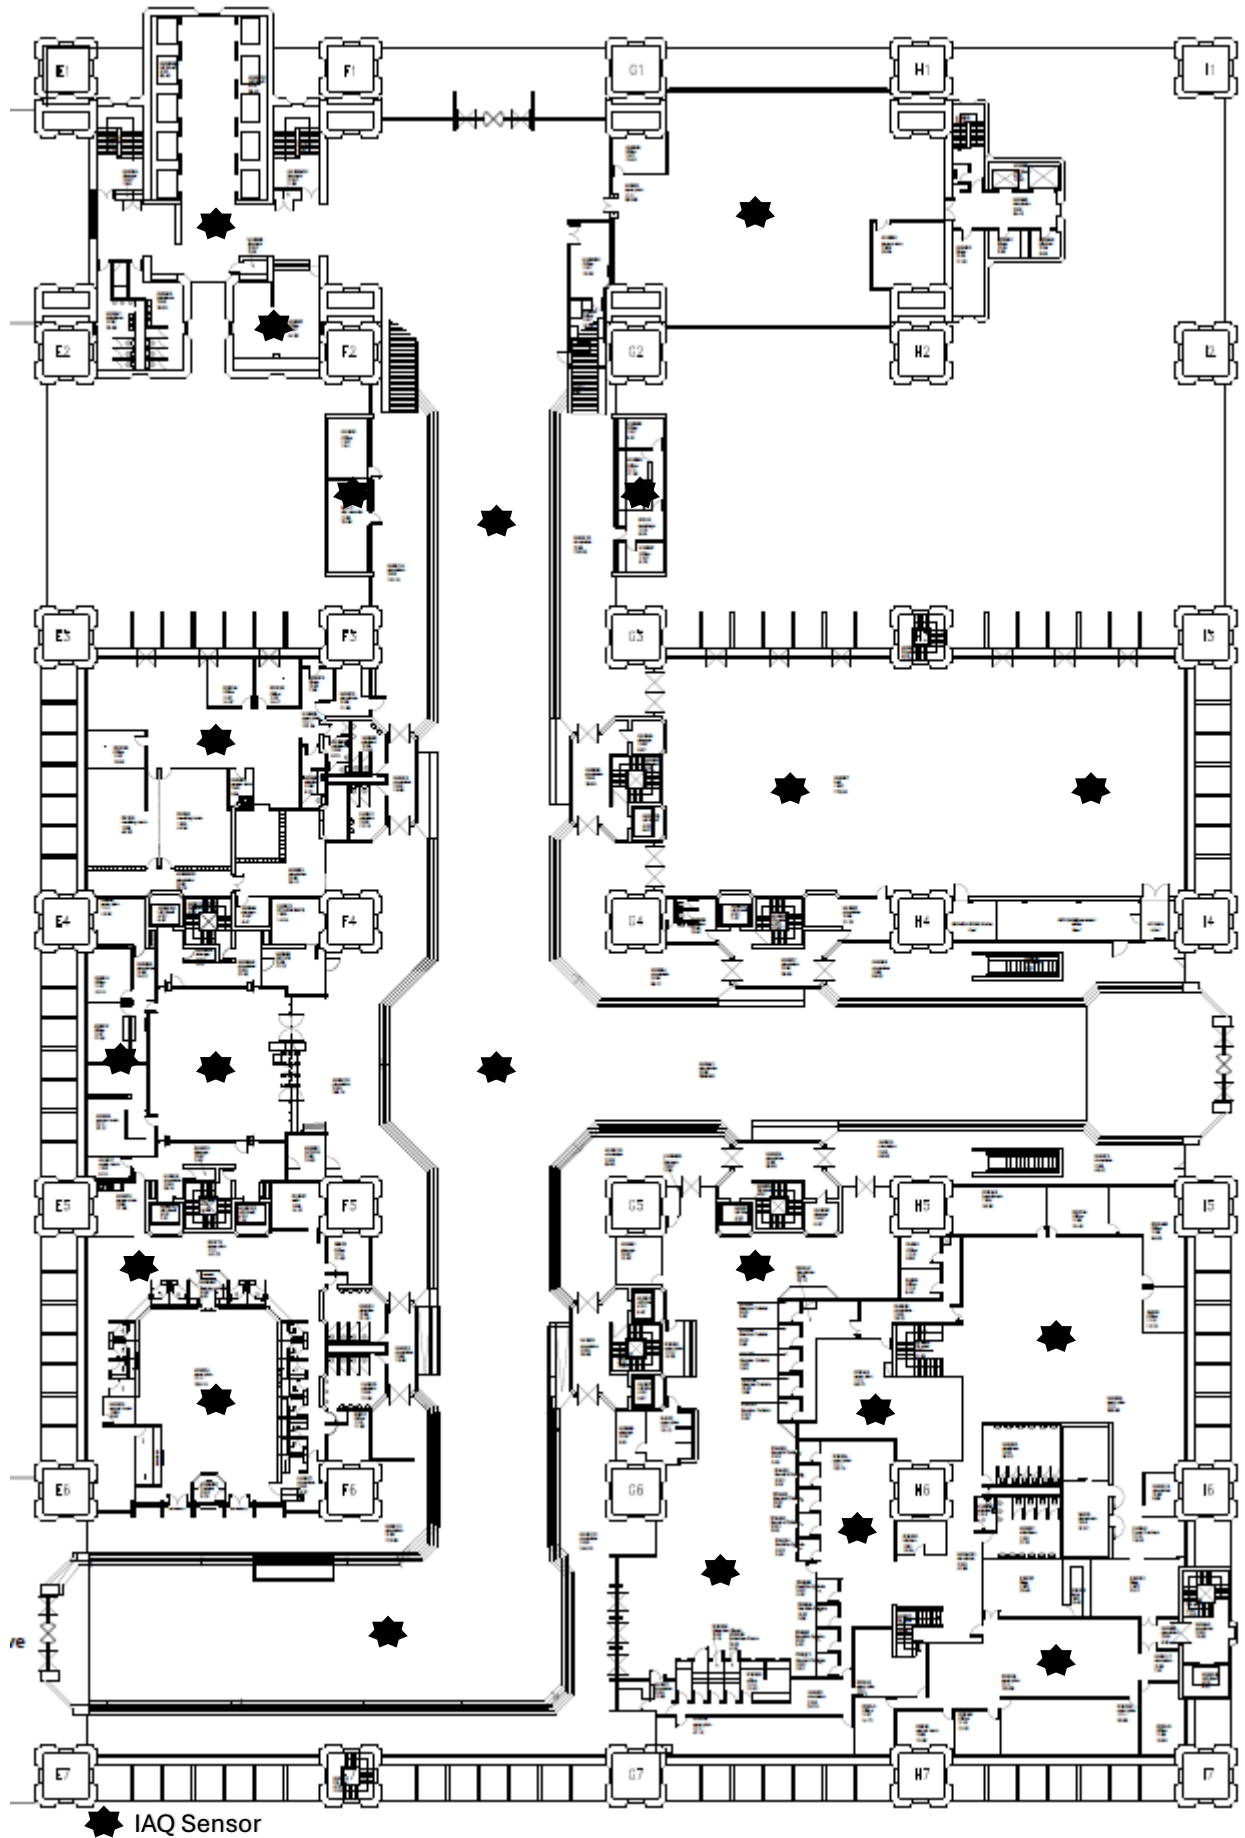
Concourse level proposed sensor positioning 2nd floor (21)
